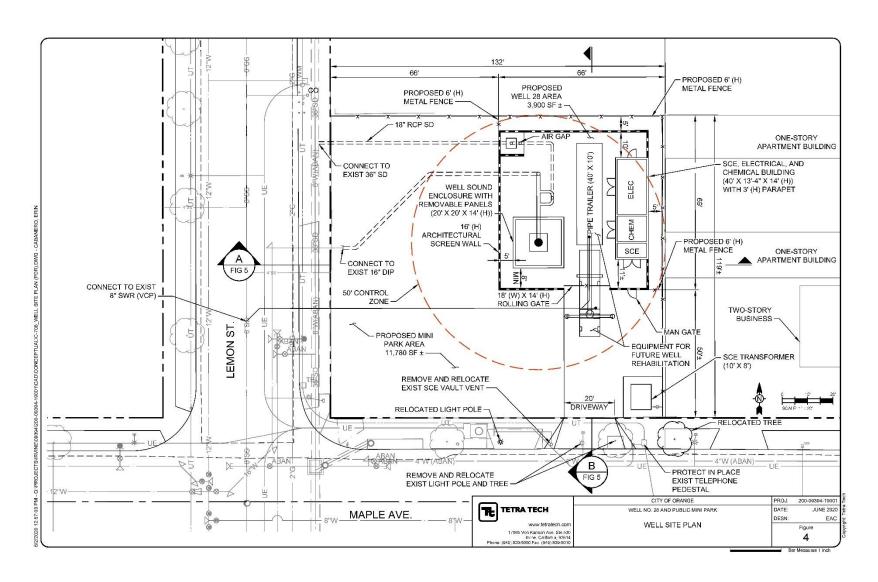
B: WELL OPERATIONS SITE PLAN
